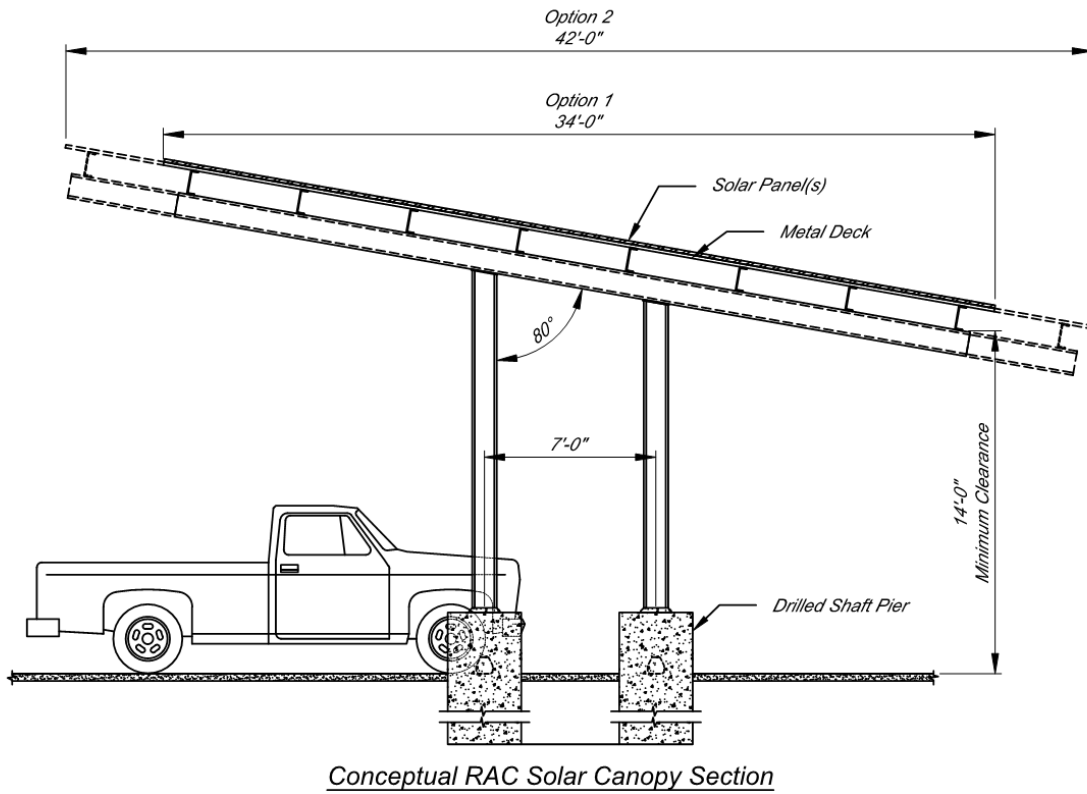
Conceptual Solar Canopy Shade Structure Elevation
